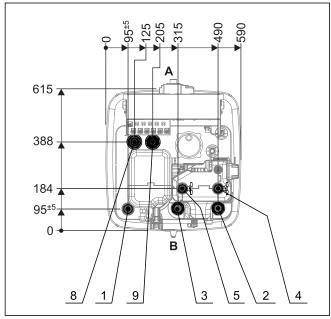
Dimensions, top of the device - Type ...04P30D/... 08P30D
